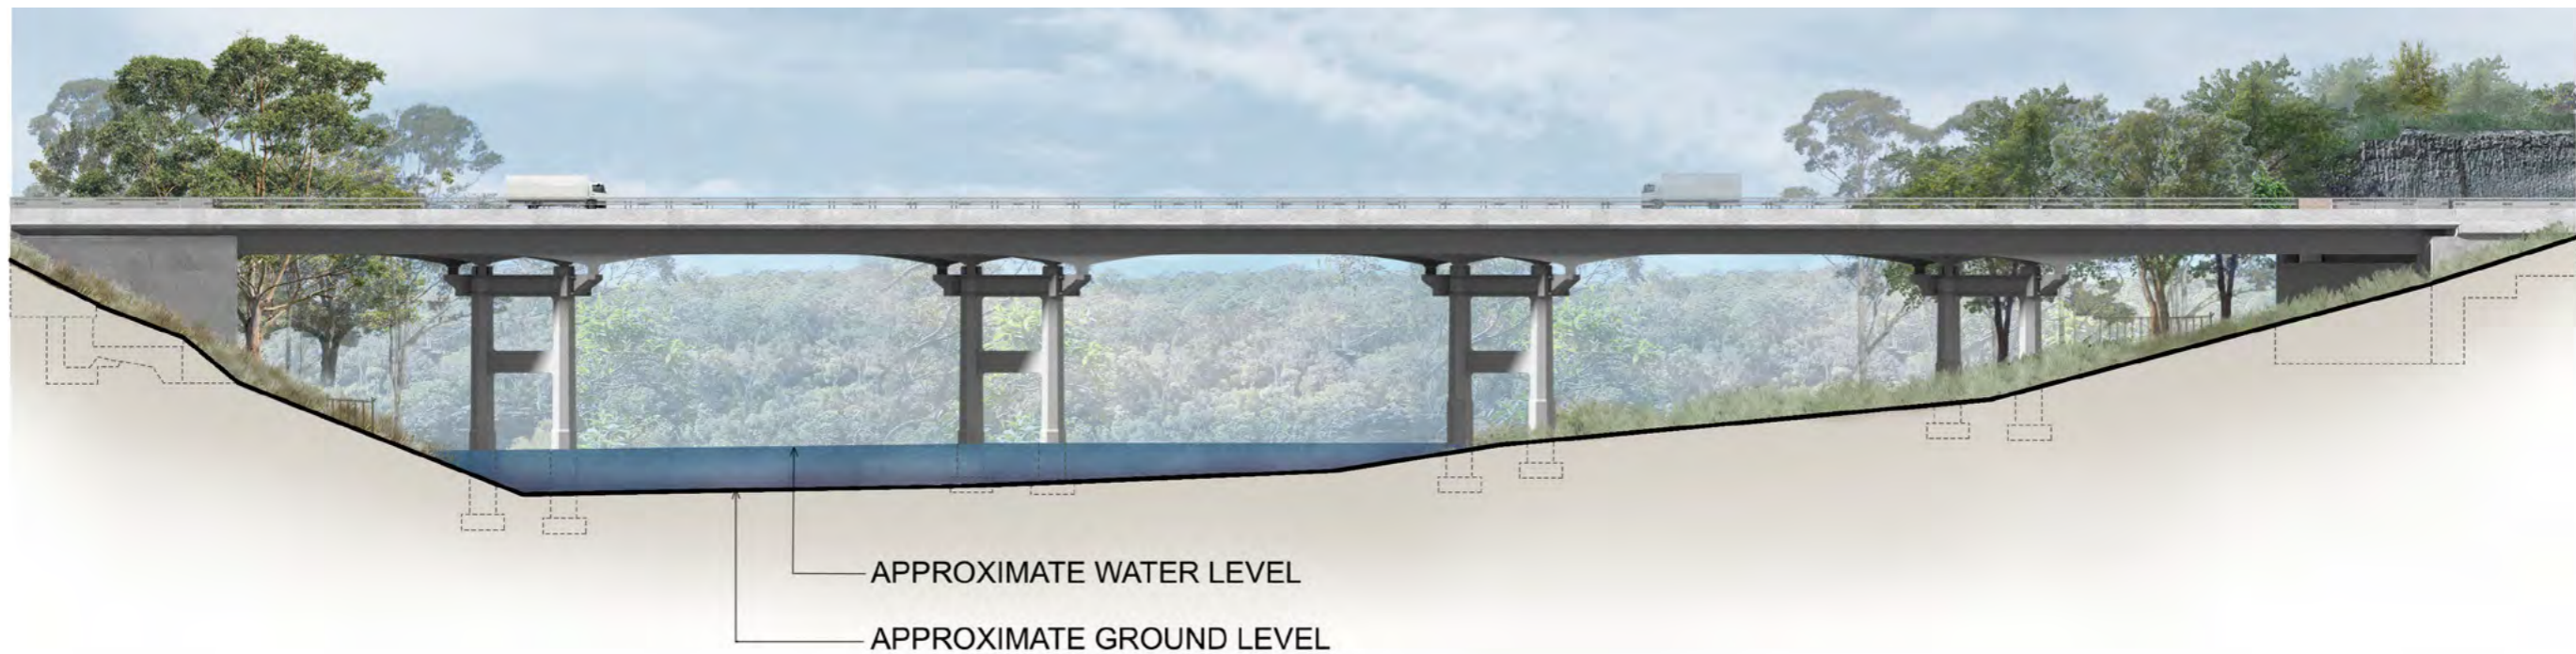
Elevation of the bridge widening. The overall character of the structure would greatly be retained
